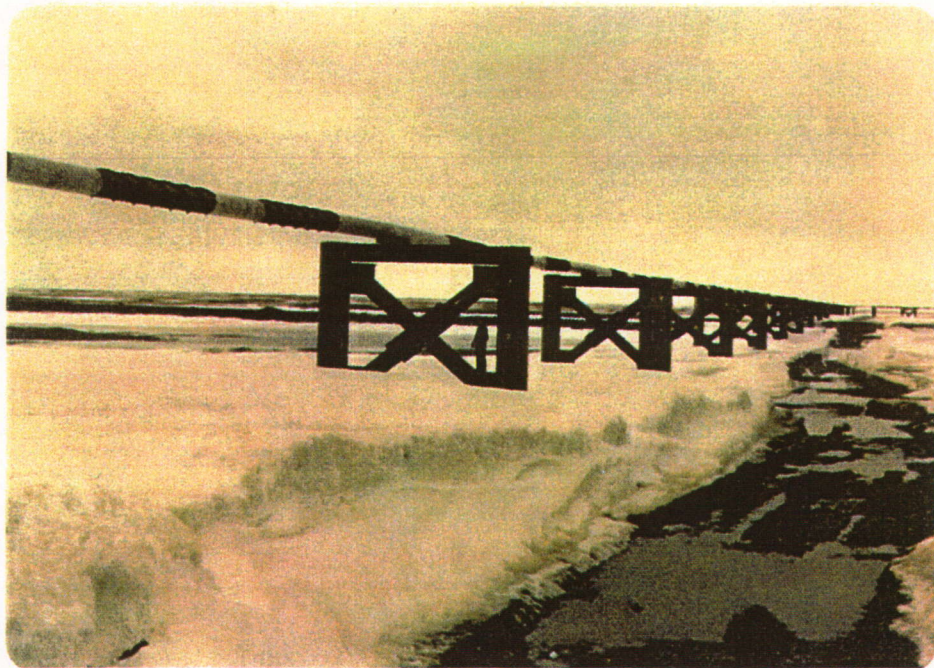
PILE-TYPE PIPELINE BRIDGE
